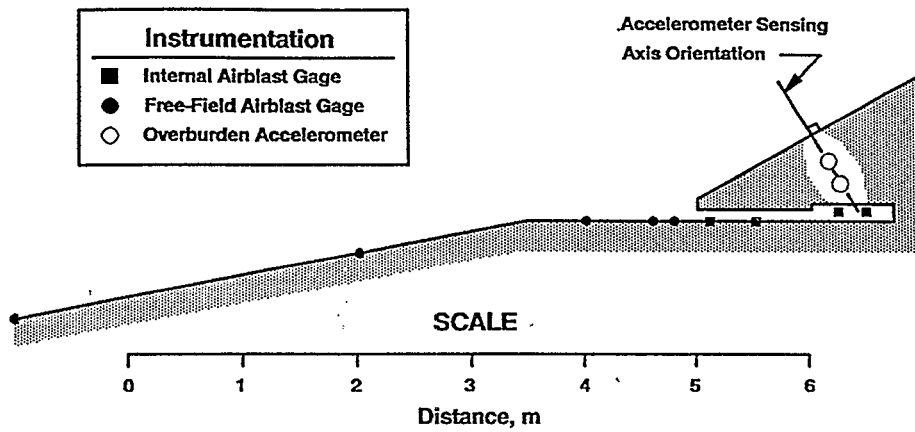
Layout (centerline profile) of 1:25-scale WES Brick Model.
